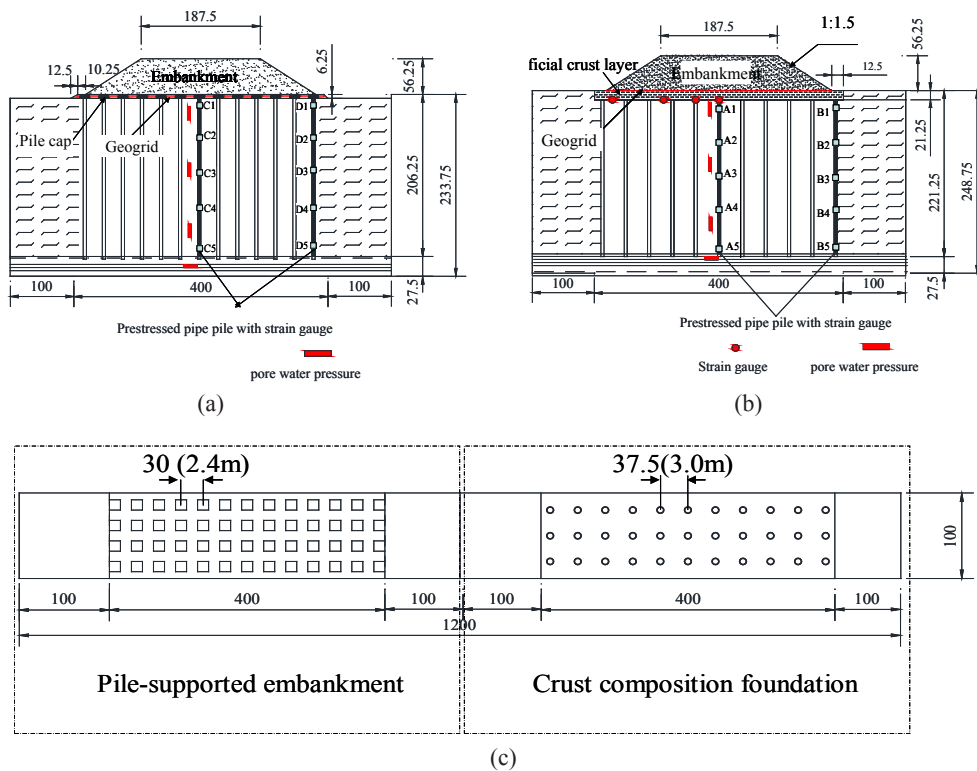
Schematic view and arrangement of test model (unit: mm) (a) Pile-supported embankment; (b) crust composite foundation; and (c) A plane diagram
